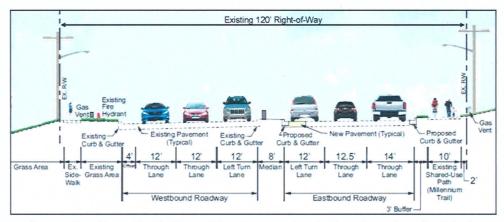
Alternative 2: Master Plan. Proposed typical roadway along East Gude Drive at Section C-C, approximately 250' west of Dover Road.
